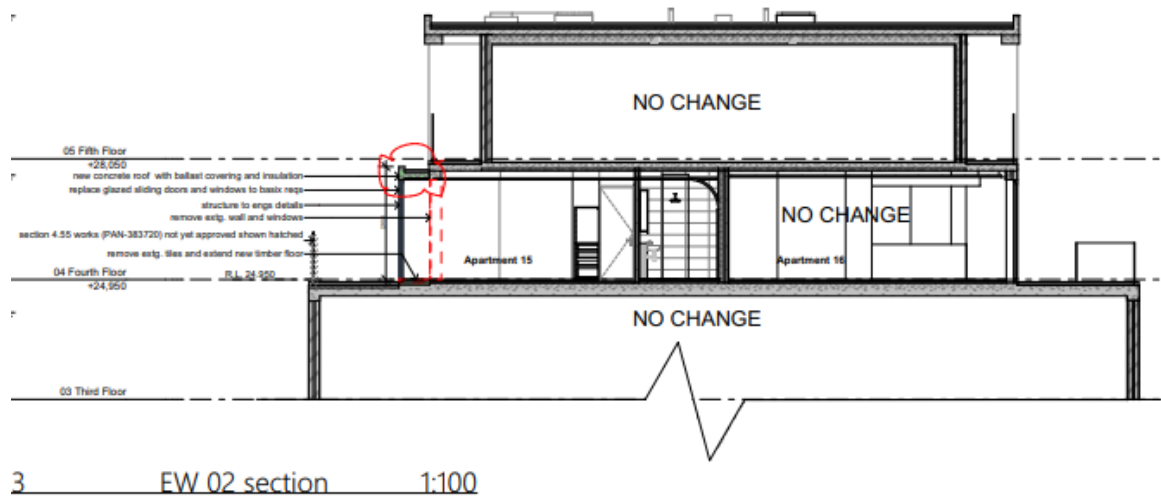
Proposed (DA-373/2023/D) section detail with concrete roof RL 27.850 (Level 4 FFL 24.950 + 2.9). Increase in height of 220mm over the approved height. (Source – RAA Architects)
